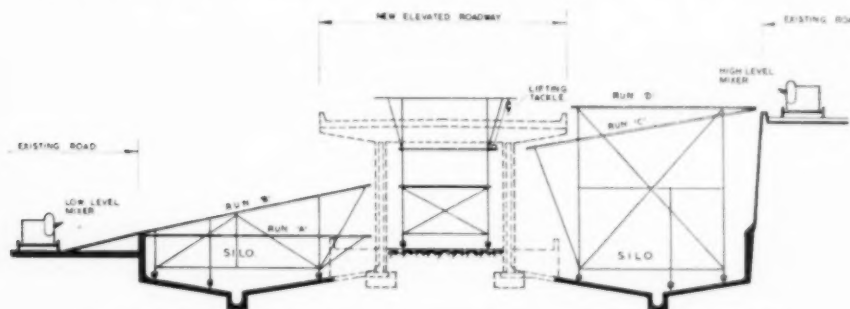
Positions of Mixers, Barrow Runs, and Movable Gantries.
